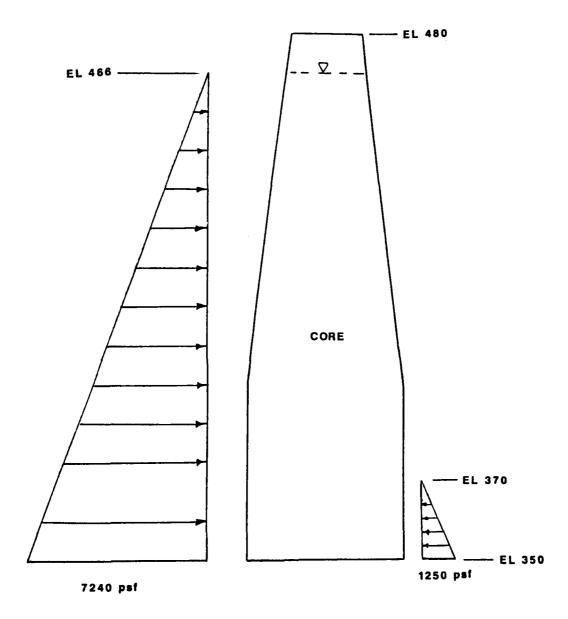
Unbalanced hydrostatic pressures acting against impervious core of the dam for undredged section
